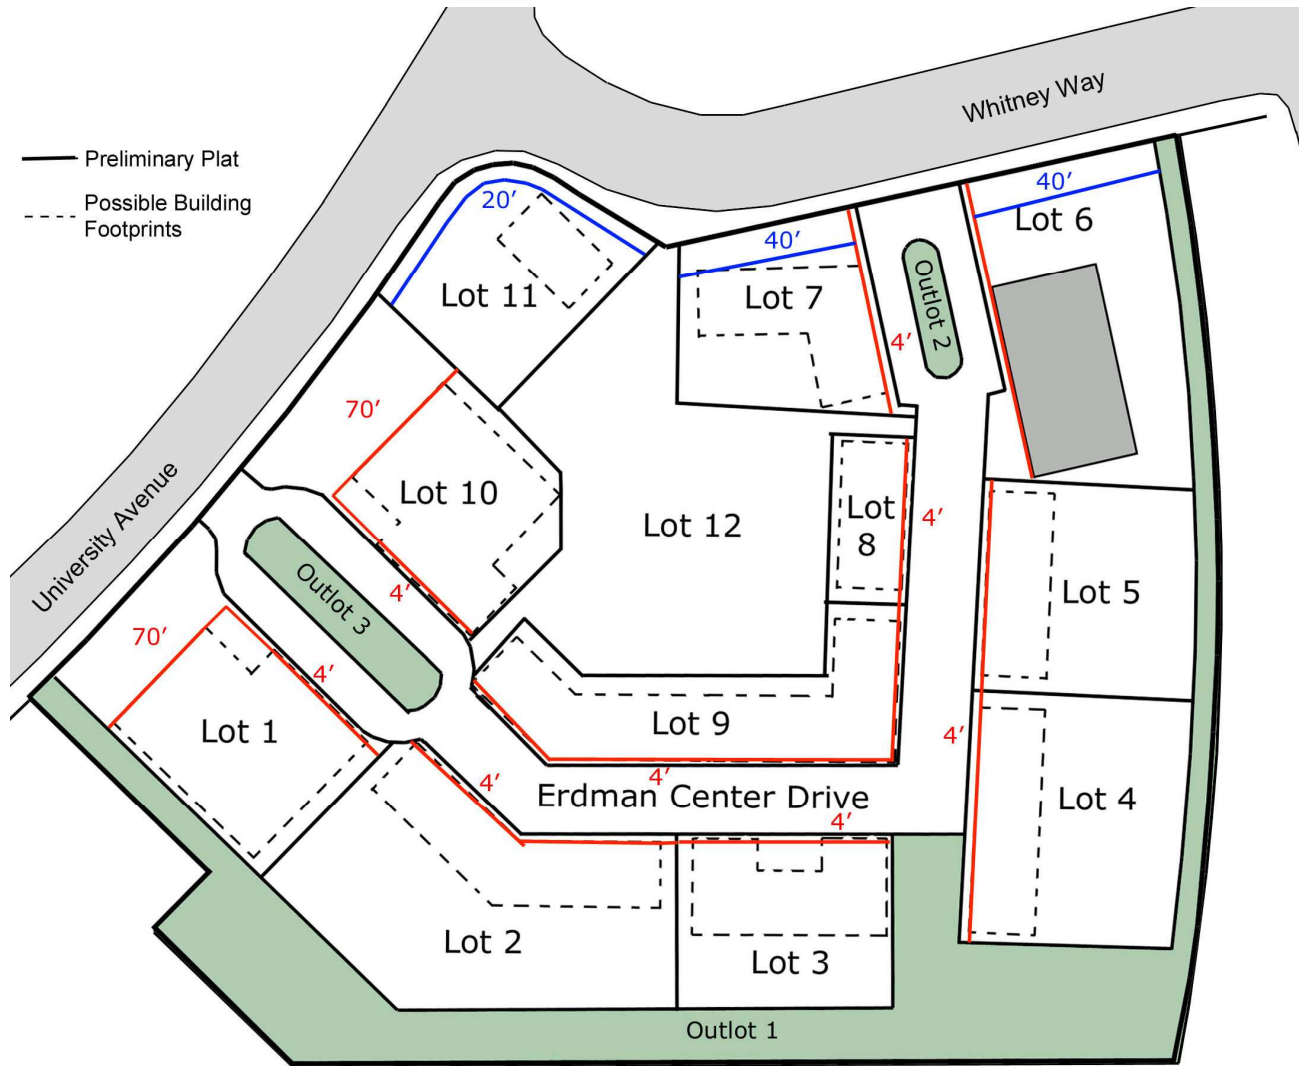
Build-To and Setback Lines governing location of building facades.
